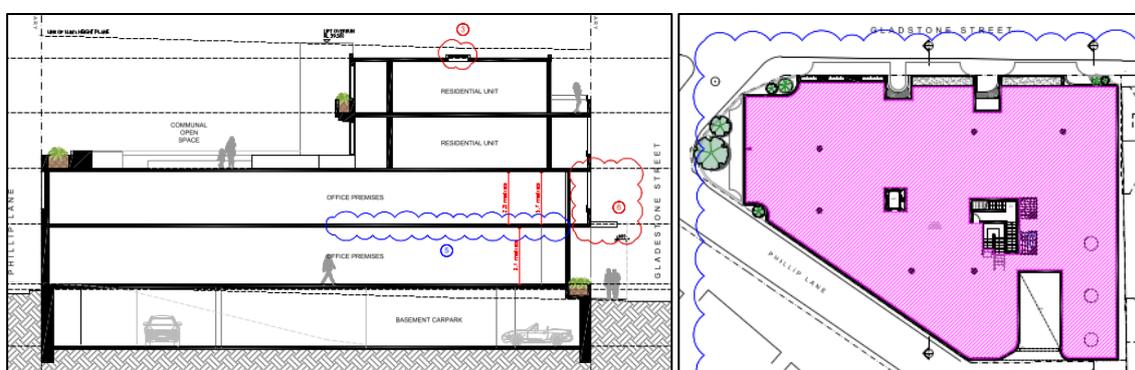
Revised plans – cross section and mezzanine/level 1 (GFA highlighted in pink)
